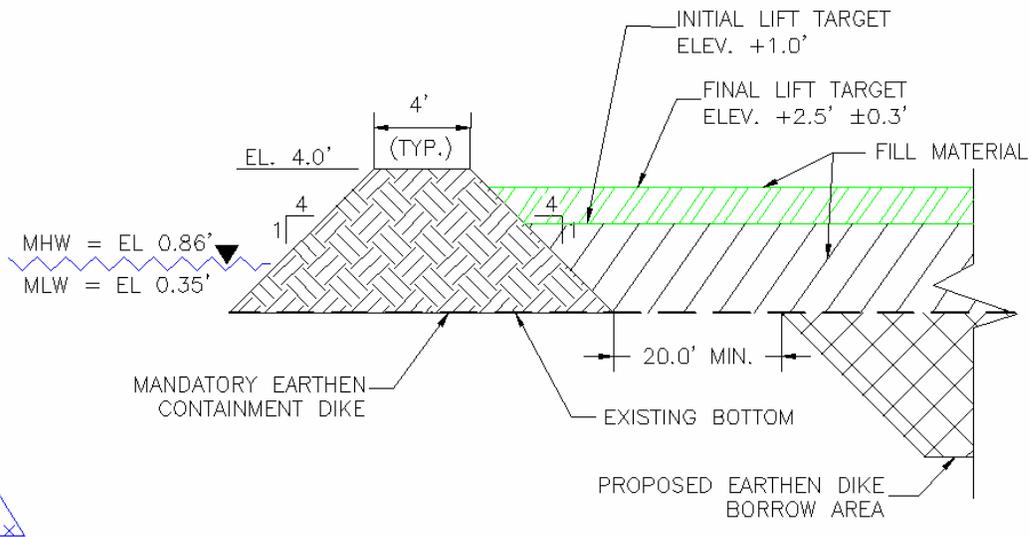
Typical Cross Section of Mandatory Earthen Containment Dikes
